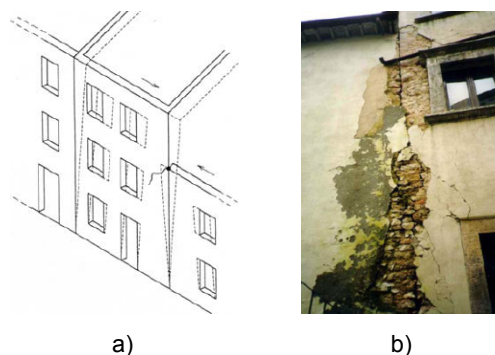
Pounding effect between adjacent buildings (Logormasino, 2007): a) Representation of the shock effect between buildings arranged in band; b) Crush between masonry walls.
